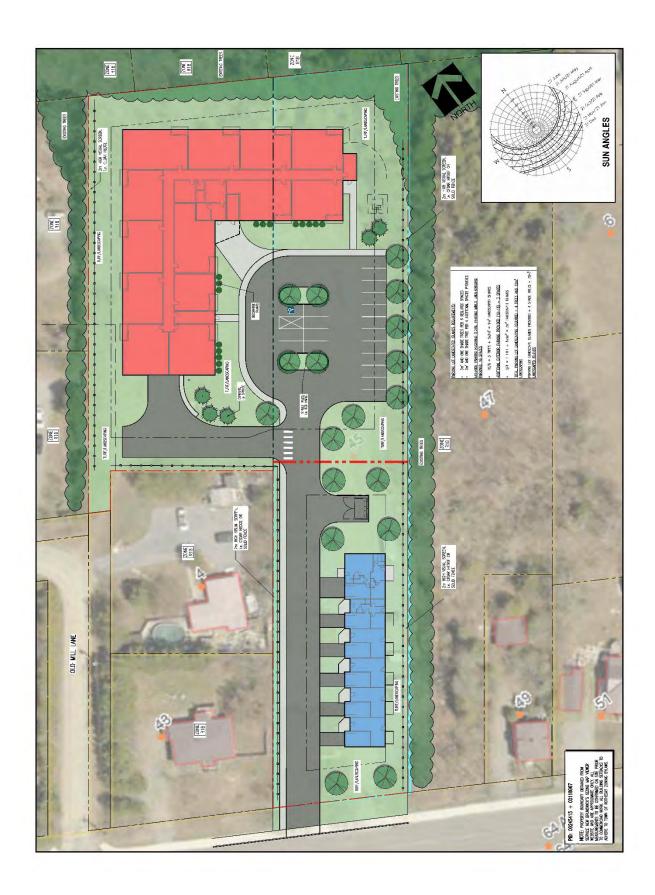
Site Plan (46-unit building and 6 Town Homes)
